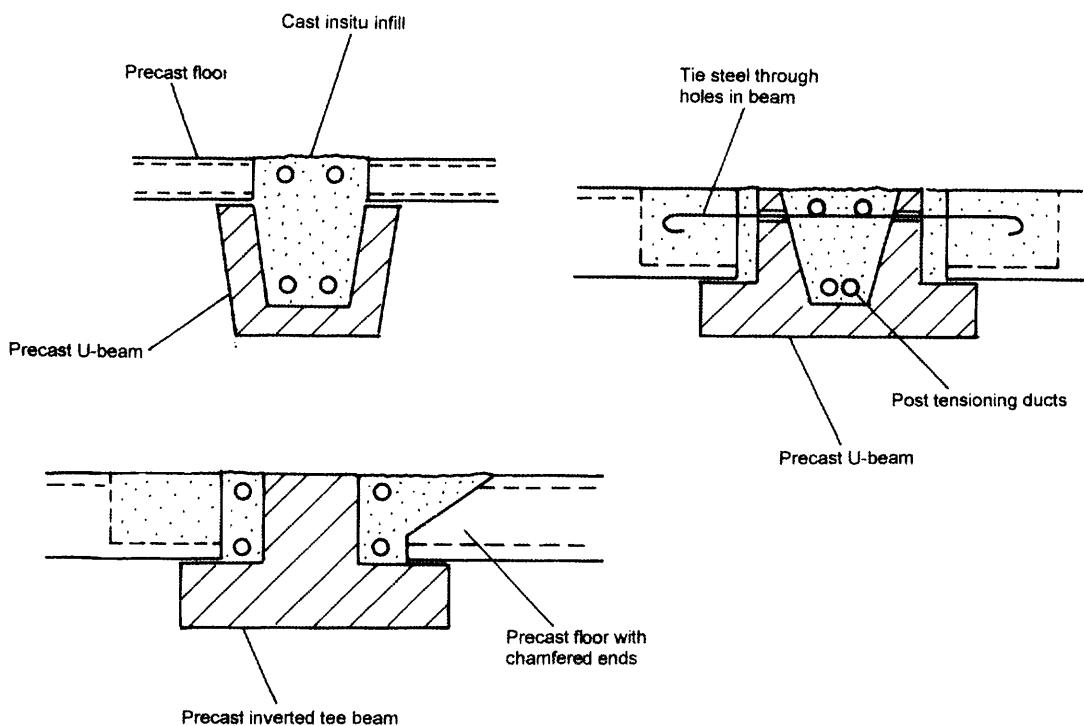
Precast beams awaiting infill concrete and post-tensioning [top] in the trough of U-beams [bottom] to the side of inverted tee beams.
